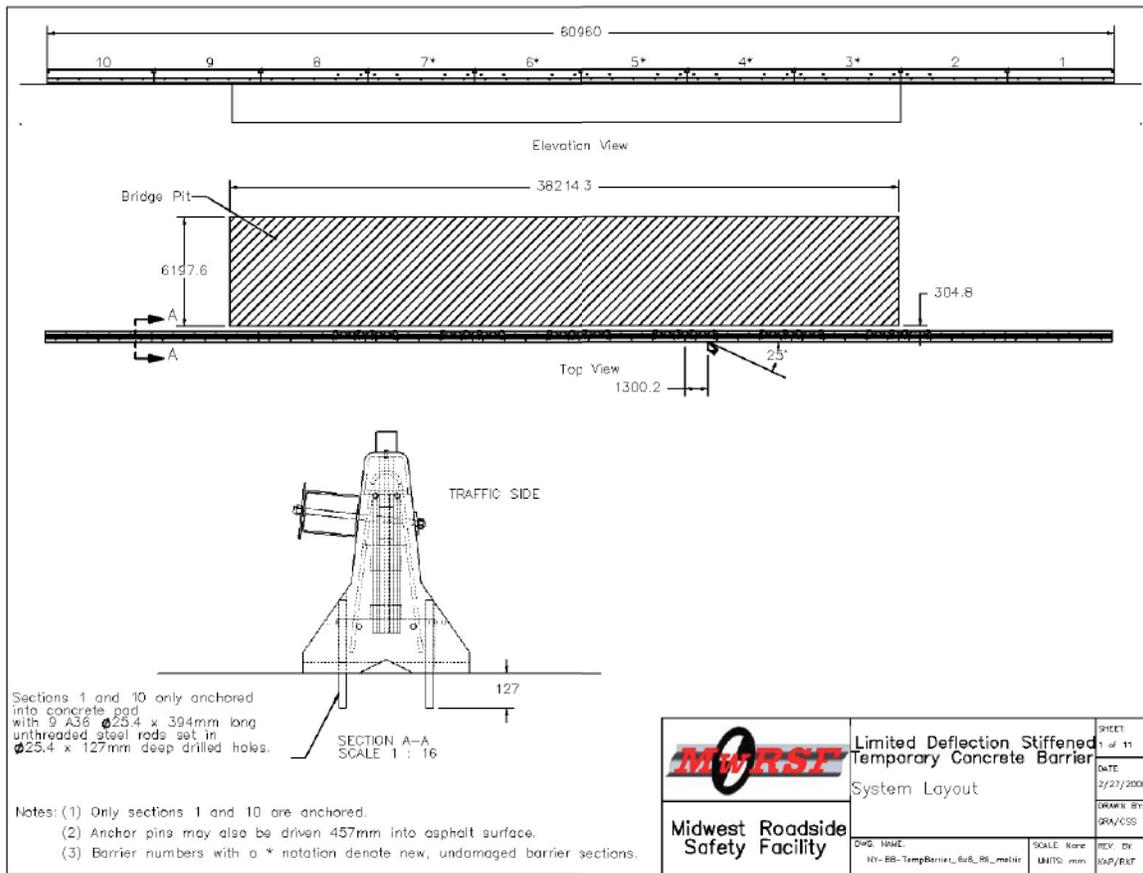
Stiffened Temporary Concrete Barrier System Layout, Test NYTCB-3
